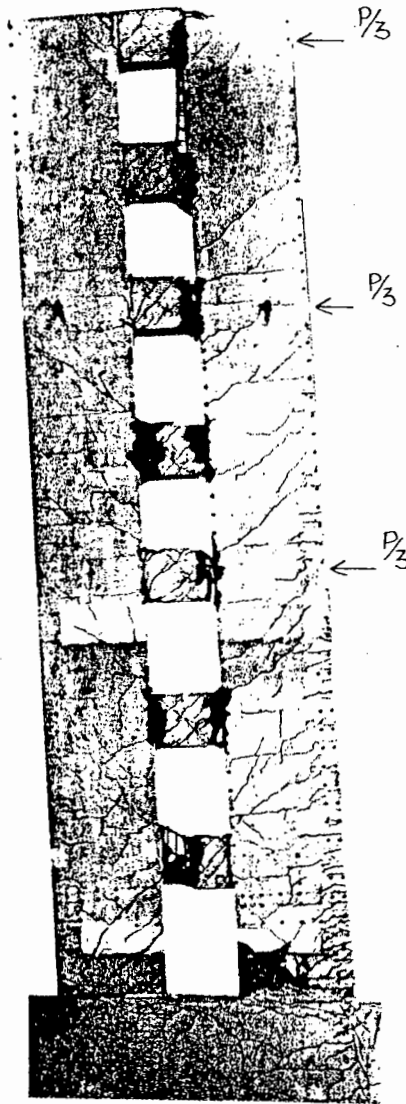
(c) : 7-Storey Wall: Actual Crack Pattern at Failure<sup>(4)</sup>
